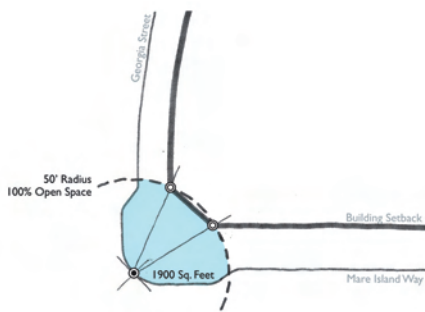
C.55: Corner Plaza Diagram, Mare Island Way & Georgia Street
